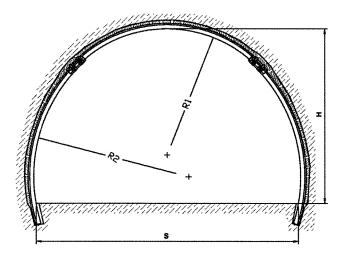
Cross-section and dimensions of development drift supported with yielding steel arches
